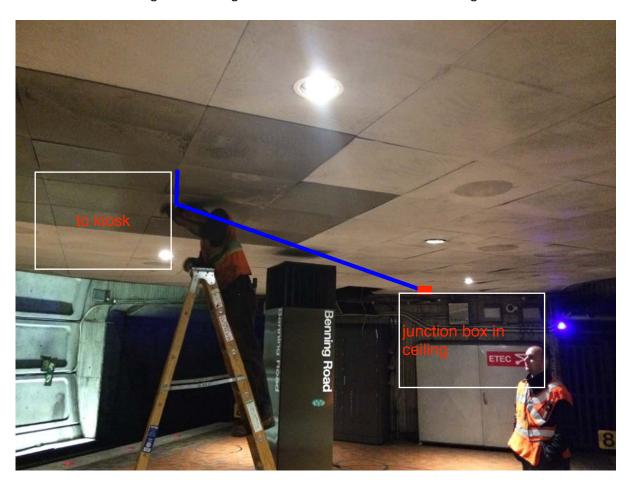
G01 Benning Road: Junction box in ceiling near wall on platform level
